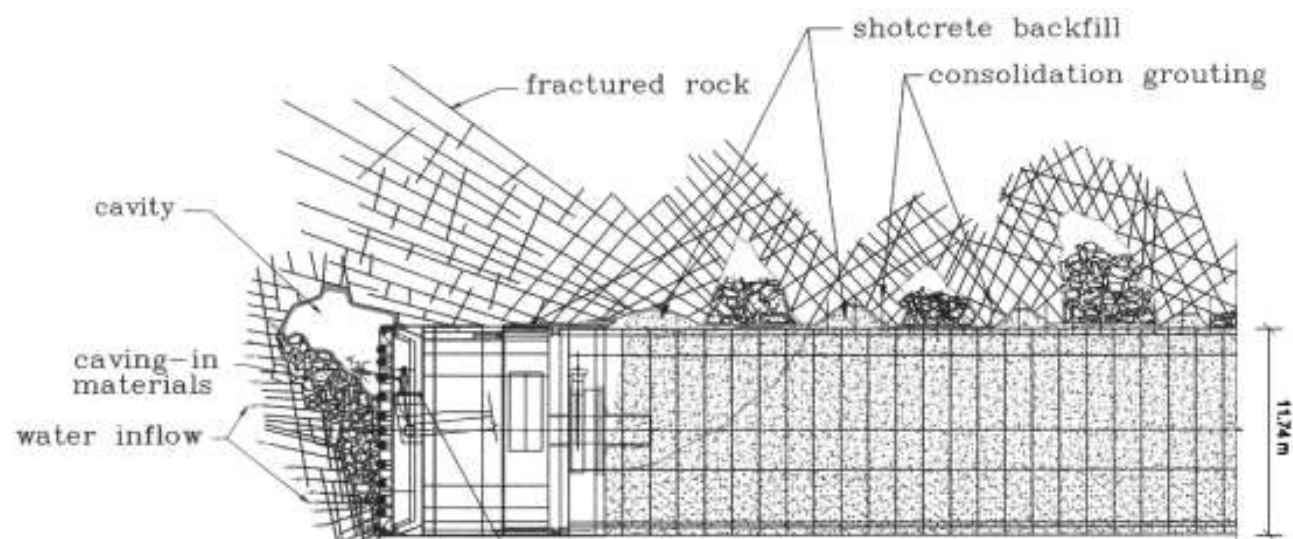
Examples of instability problems at the tunnel excavation (adopted from [7]).
